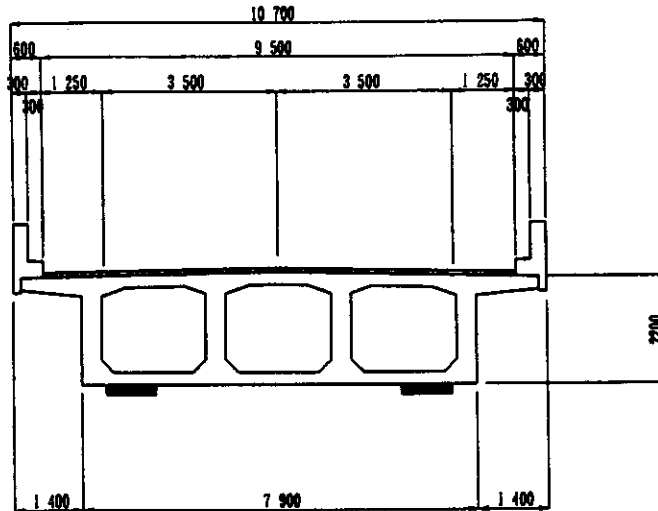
(c) Typical section of prestressed concrete box girder model bridges
